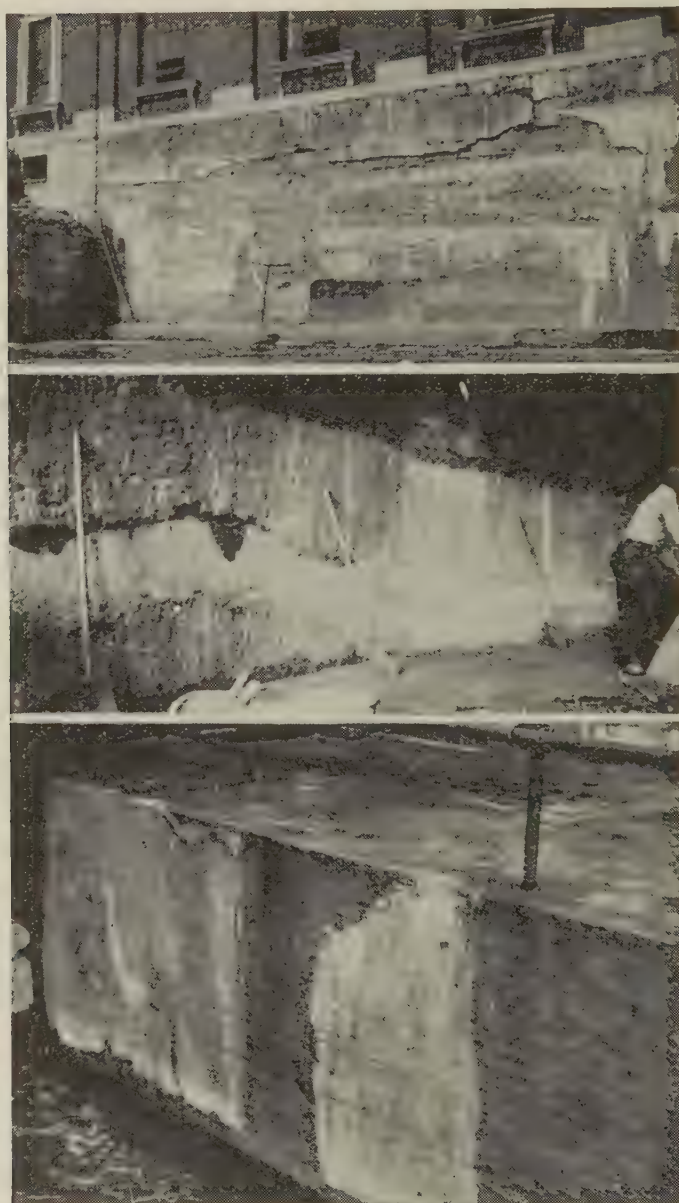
SPALLING IN ADVANCED STAGES ON TAILRACE WALL
